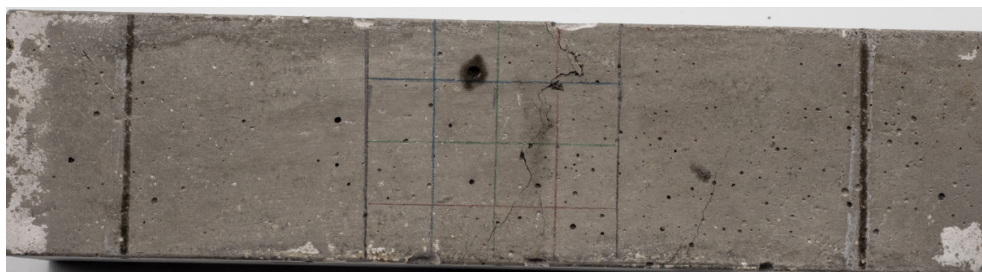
Localized macro-crack (specimen 3.0%-400-2).
